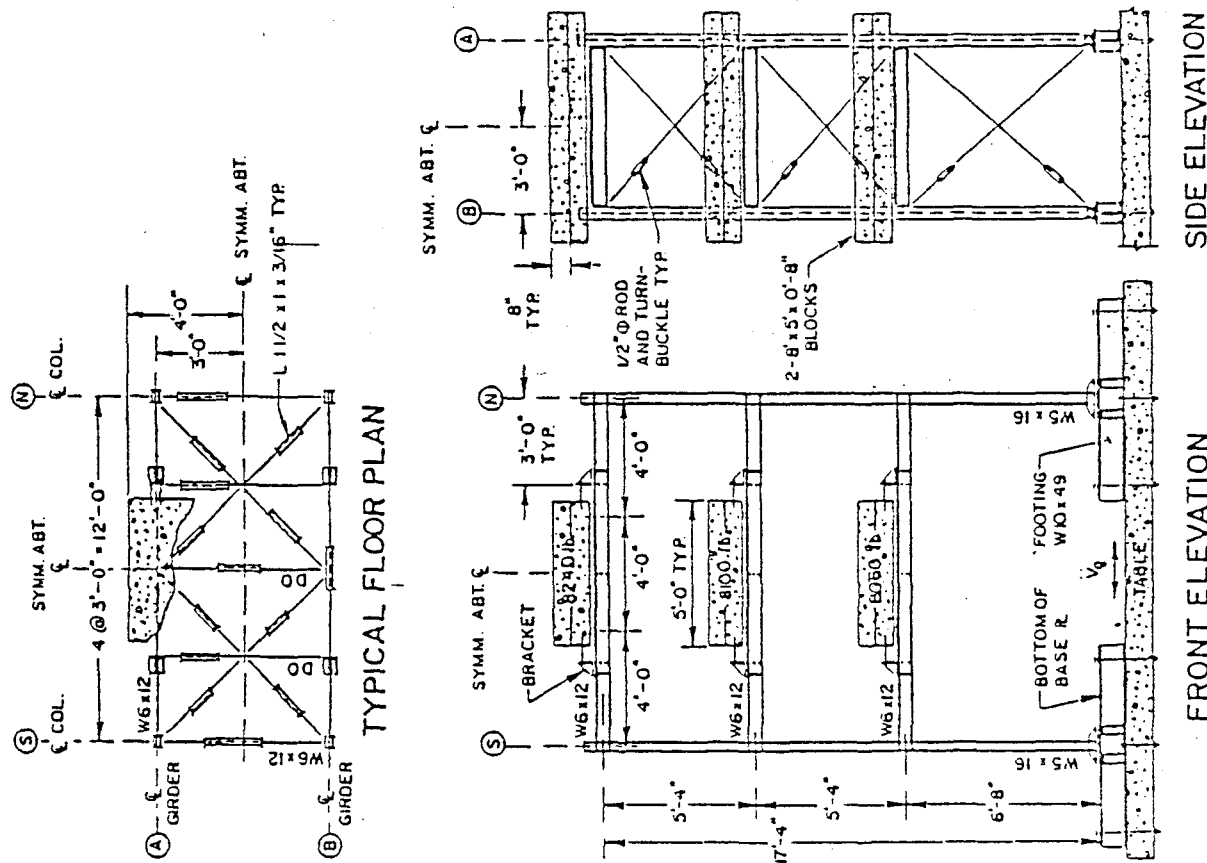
PLAN AND ELEVATIONS OF THE TEST STRUCTURE [8]
